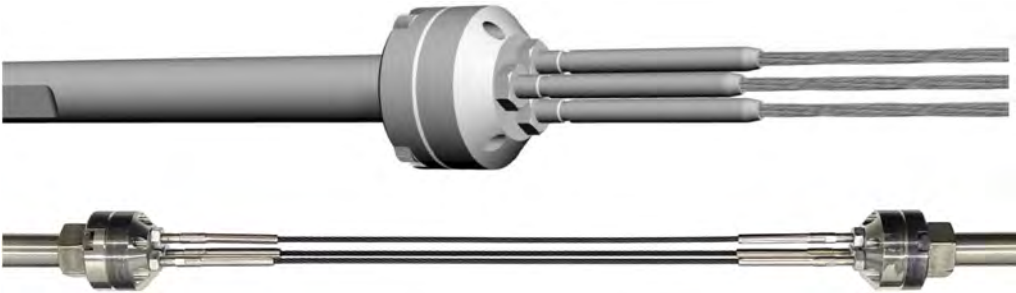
SMA connection to tension rod render (top) and photo (bottom).
